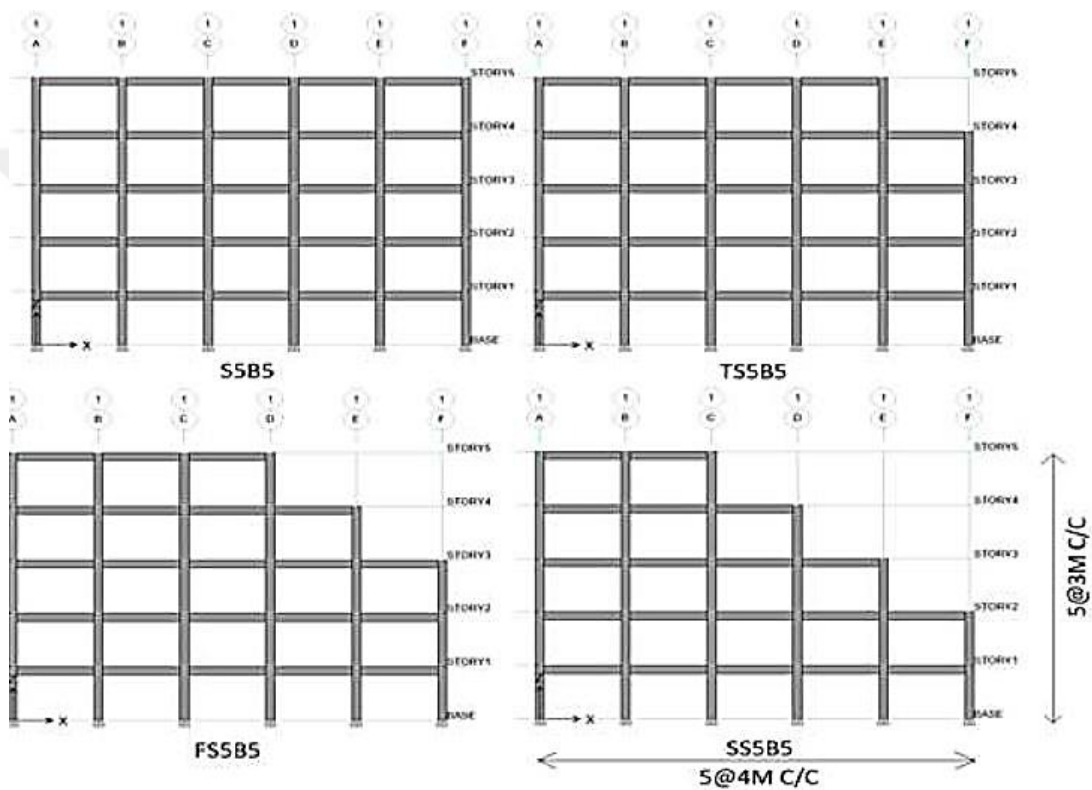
Typical elevation of example frame models (Naik et al., 2015)
